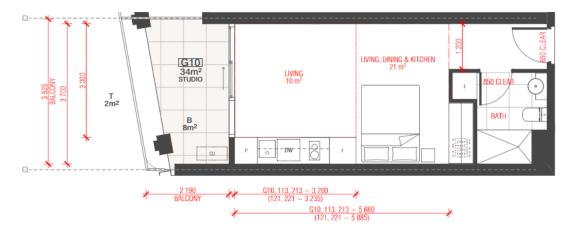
Proposed Amendment Ground Floor Location of Studio Type 1
